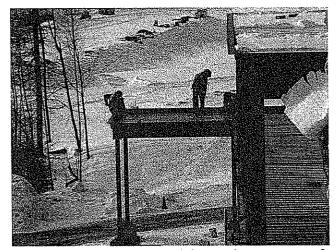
View west toward the southwest corner of the building (segment D). January 4, 2011.
